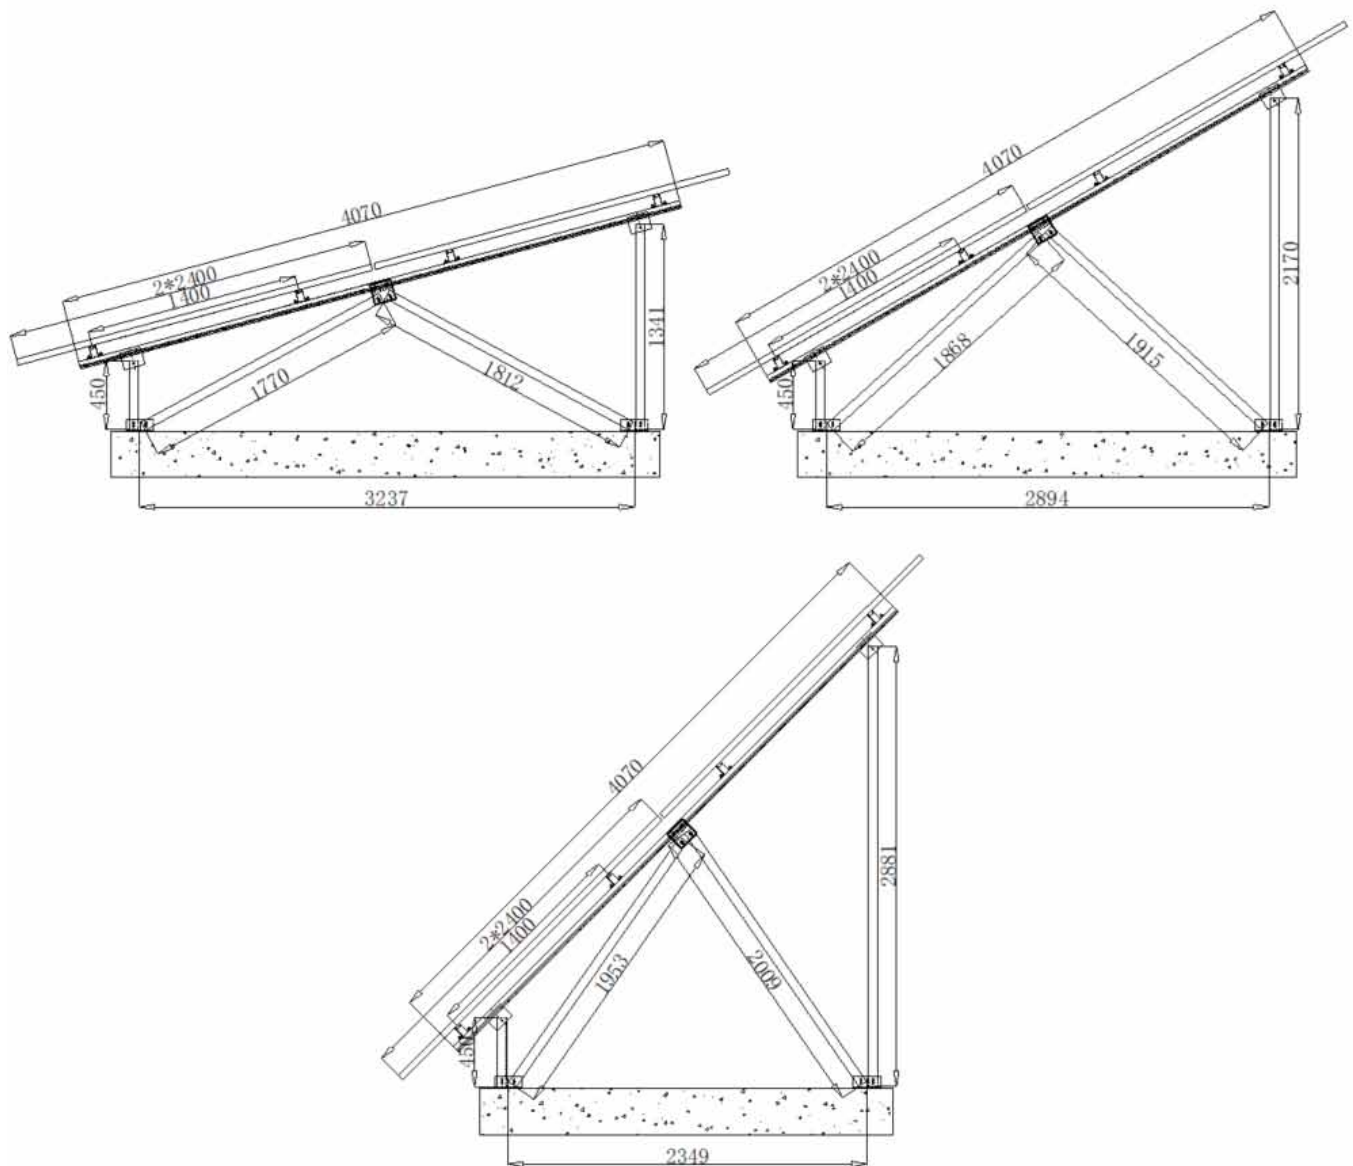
PV Panel 2400x1200mm with Concrete Footing Details
